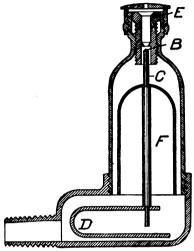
Radiator Automatic Air-Valve. Operated by Metal Strip D. Consisting of Two Pieces of Metal of Unequal Expansive Power.
